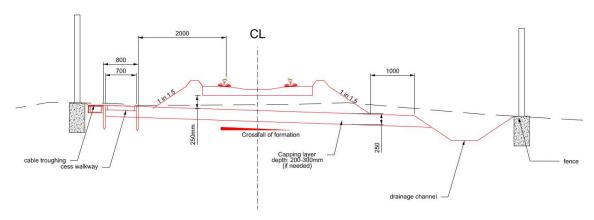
Typical track cross-section with cess walkway and drainage ditch
